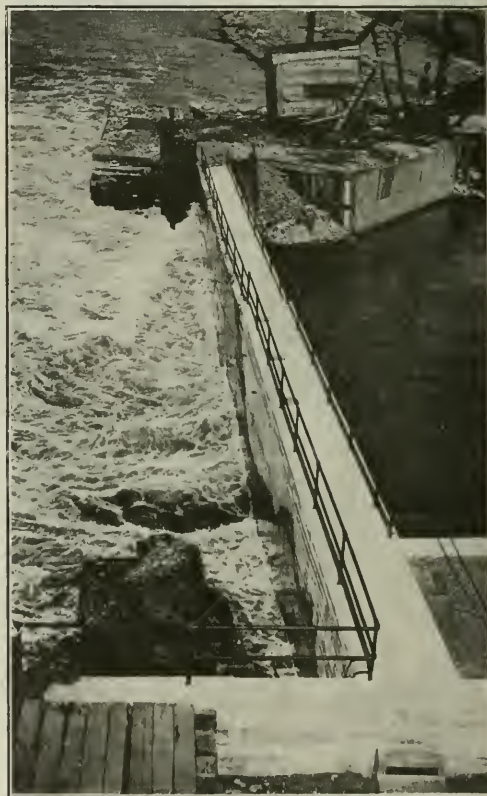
NEW CONCRETE WALL WITH BASE PROTECTION
